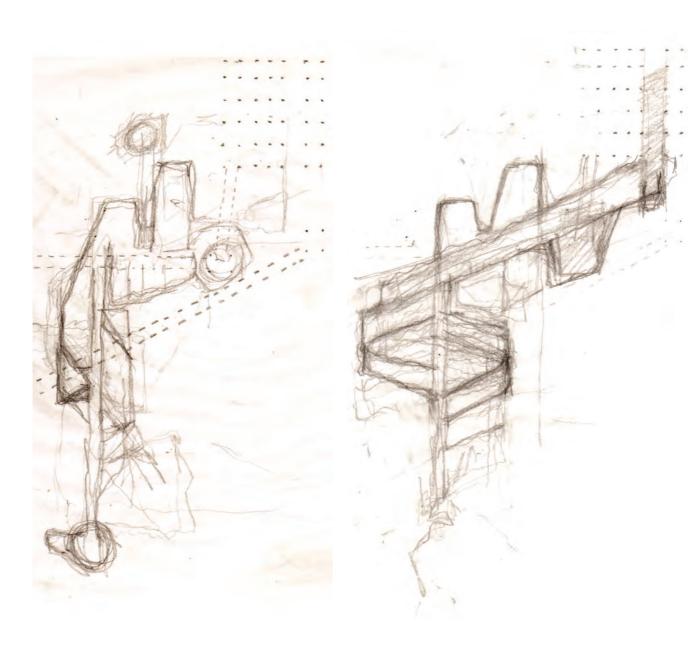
(left) Plan exploration 1 (Author 2014).
